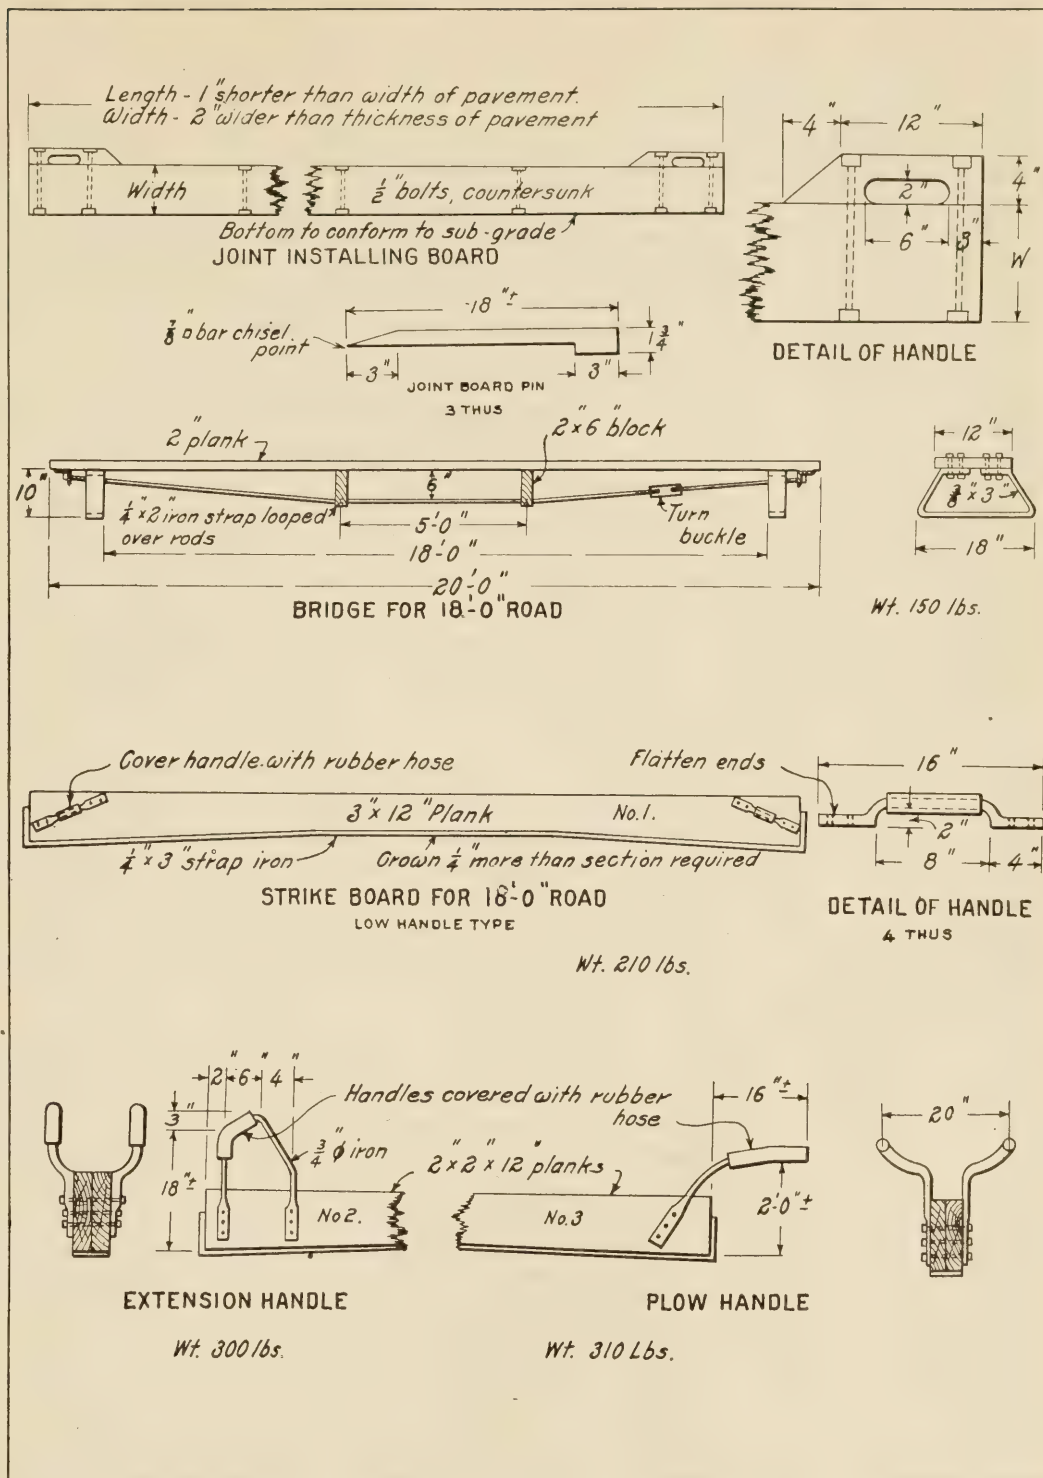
PLATE I. TOOLS USED IN THE CONSTRUCTION OF CONCRETE PAVEMENTS.
